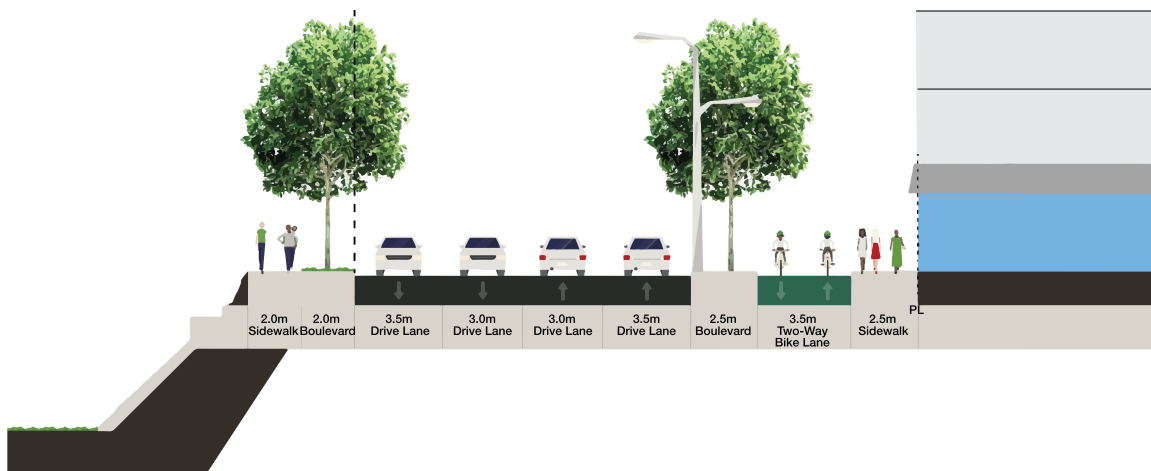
Conceptual cross section for Ravine Way (20 metres)
